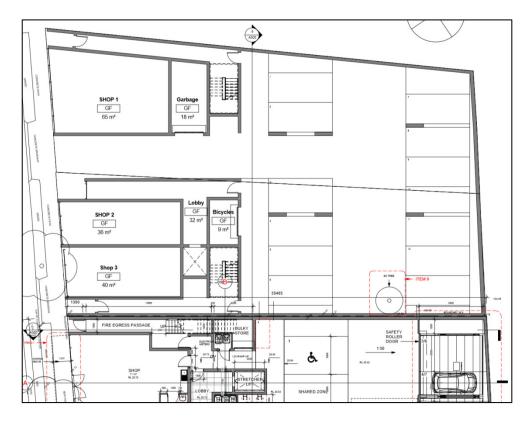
Extract of concept ground floor layout of No.55&57 Warren Road
